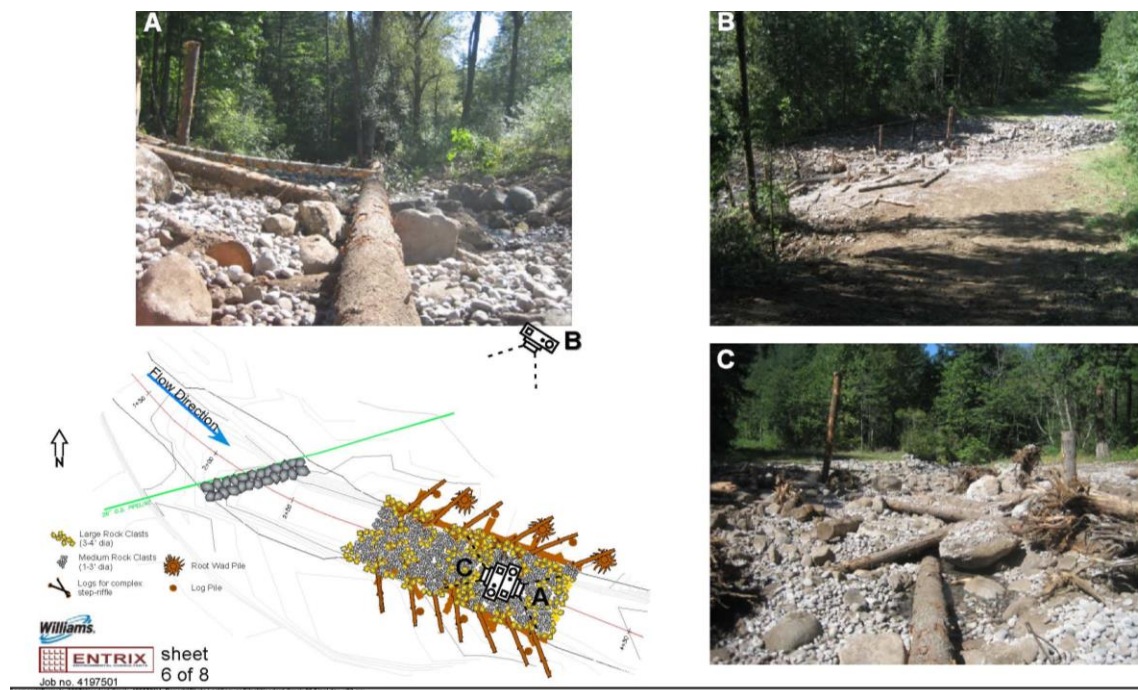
As-built construction in September 2008. Final structure forming a complex multi-step grade structure that raised creek about 2 m, providing about 0.4 m of additional cover over pipeline crossing. Final elevation of left bank floodplain was estimated to inundate with a 5 yr recurrence flood event..
